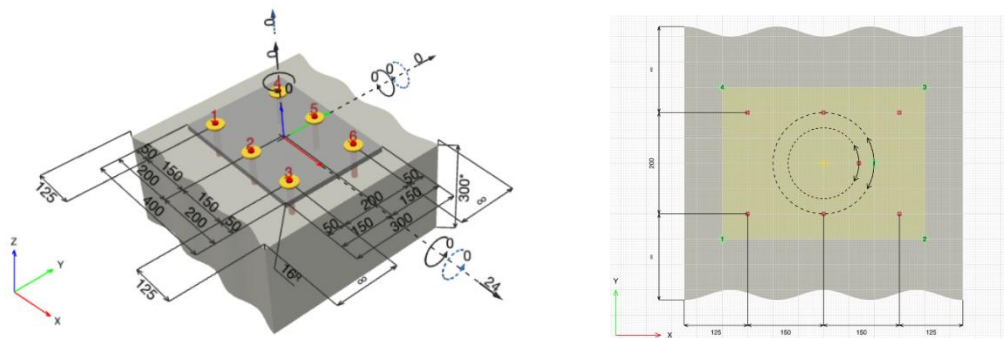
Baseplate connection using post-installed adhesive anchors
